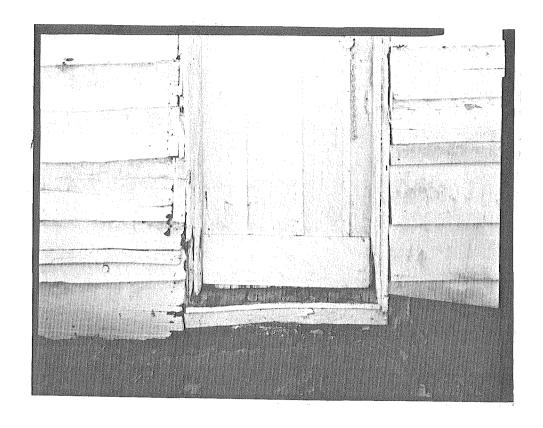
Bunker Hill Quarter, detail of door sill on southeast elevation, looking west.
